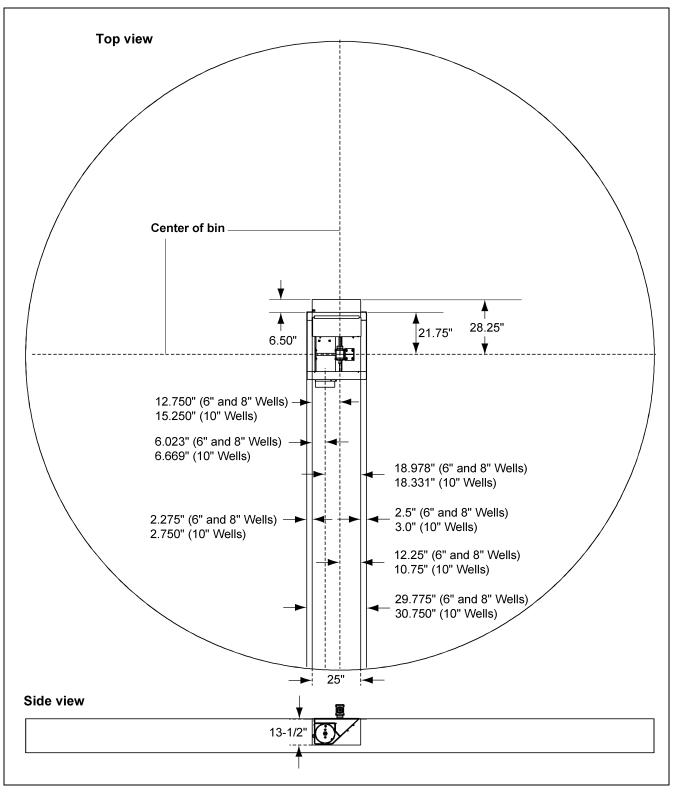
A Concrete Trench Layout for 6", 8" and 10" Power Sweeps
